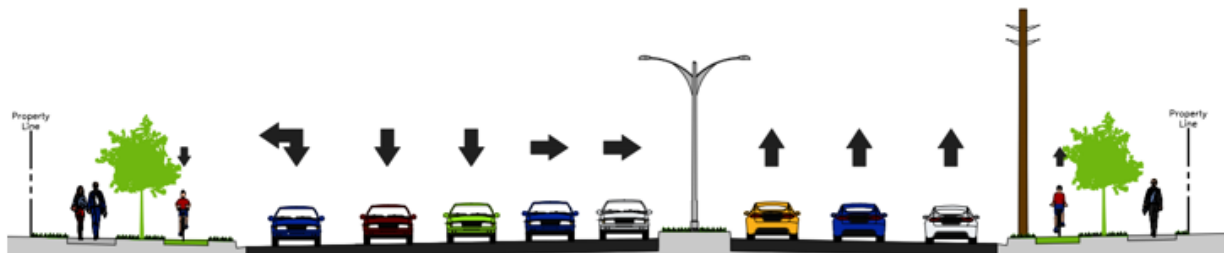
Preferred Fanshawe Park Road Cross-Section, East of Richmond Street (Looking East)
